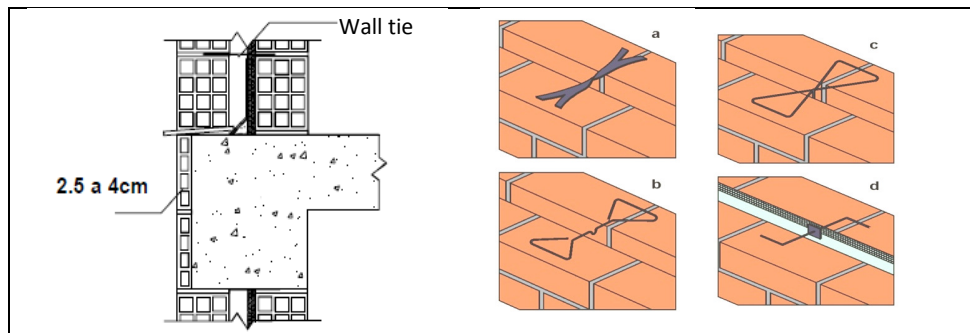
Wall ties- examples of wall ties connecting two leaves of a cavity wall
